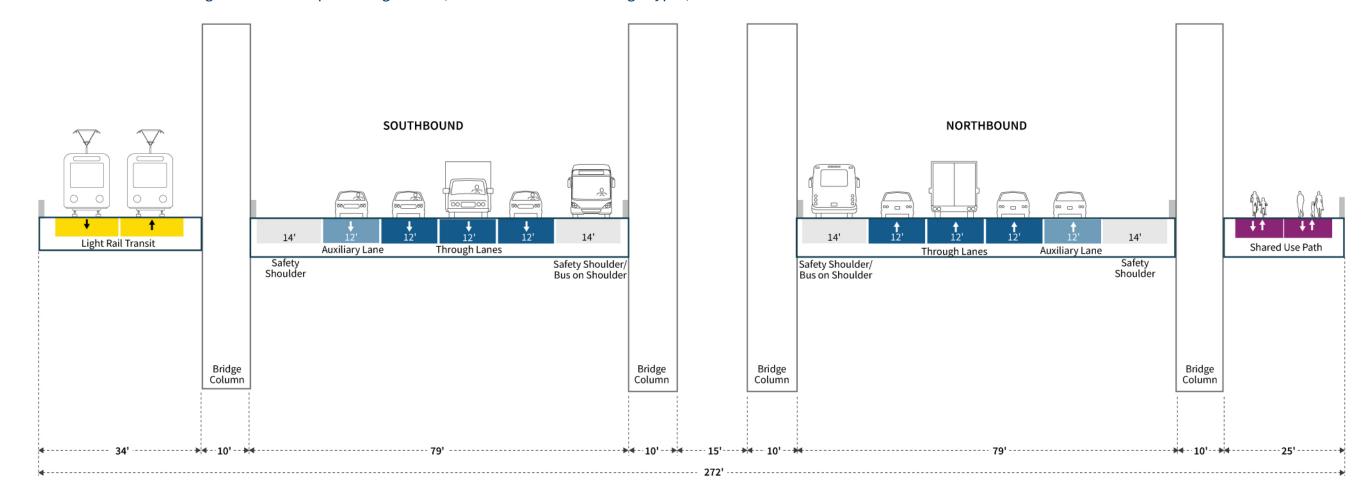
Cross Section of the Single-Level Fixed-Span Configuration (Extradosed or Finback Bridge Types)
